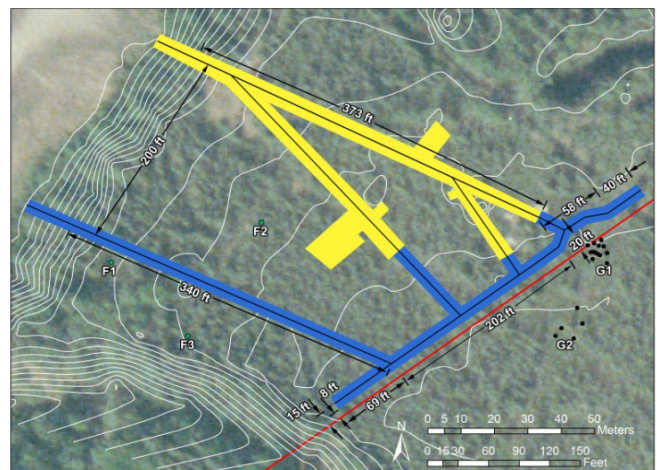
Old Tunnel (yellow) and New Tunnel (blue) plan view.
